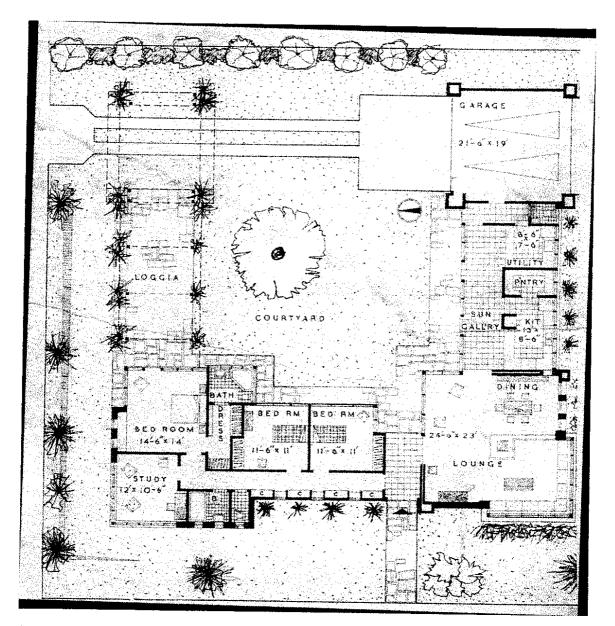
Plan of Building 2 wirra Close, St, Ives B. Robertson, Robertson & Hindmarsh c.1962
